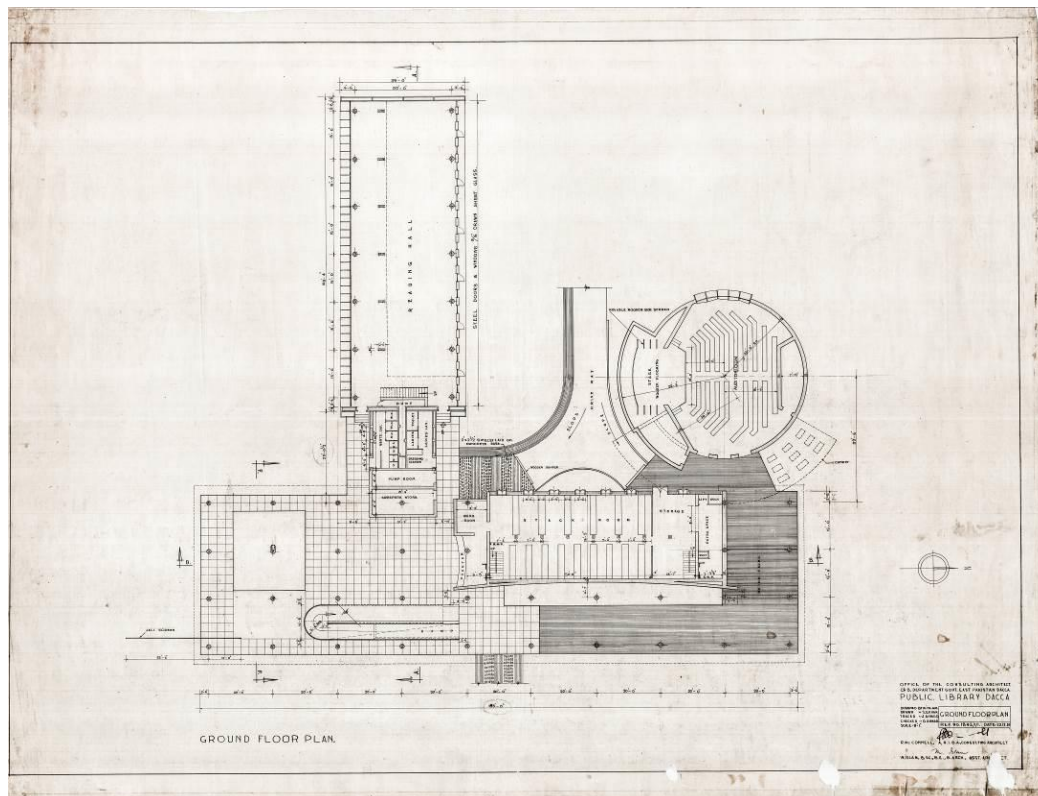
Ground floor plan Office of Consulting Architect. CBB Department of Cont. Of East Pakistan Dacca. Public Library, Dacca.
